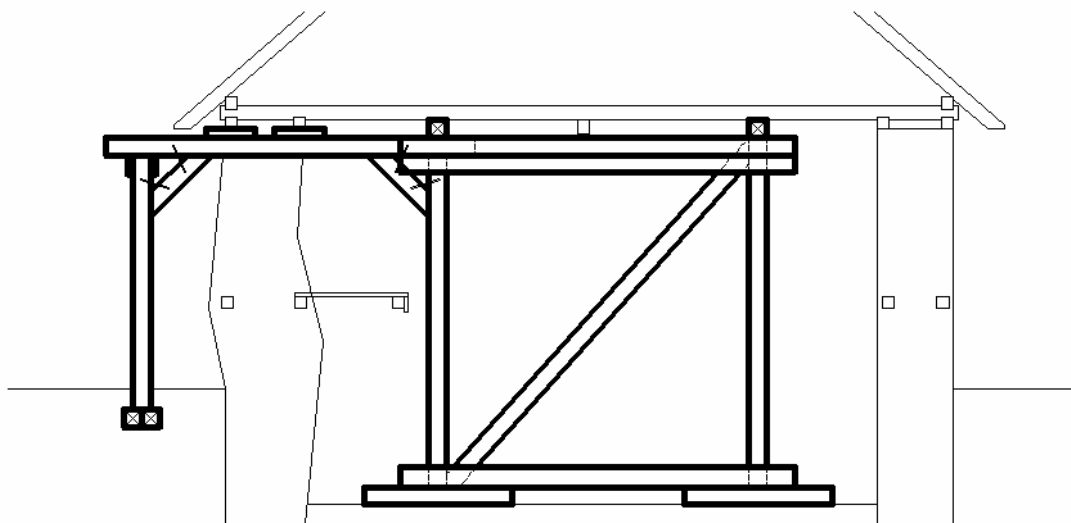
Characteristic section with one of four parallel timber frames temporary supporting top timber lacing and the upper floor structure
